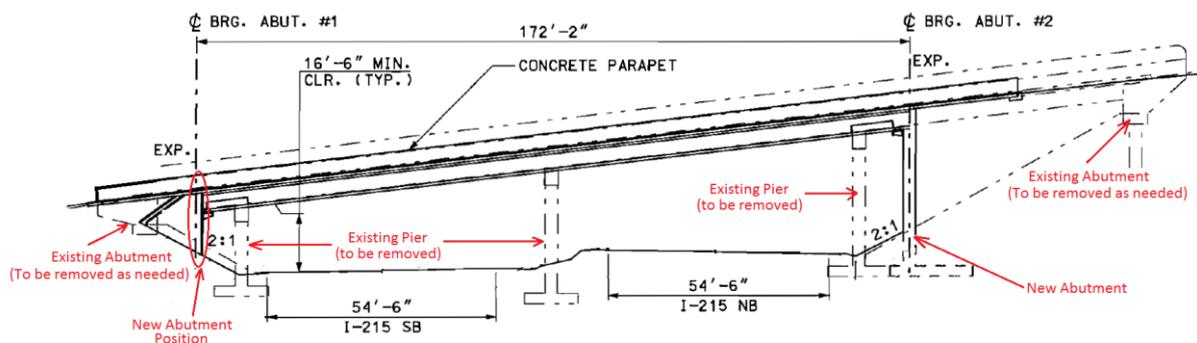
4500 South (SR-266) over I-215 bridge elevation view
